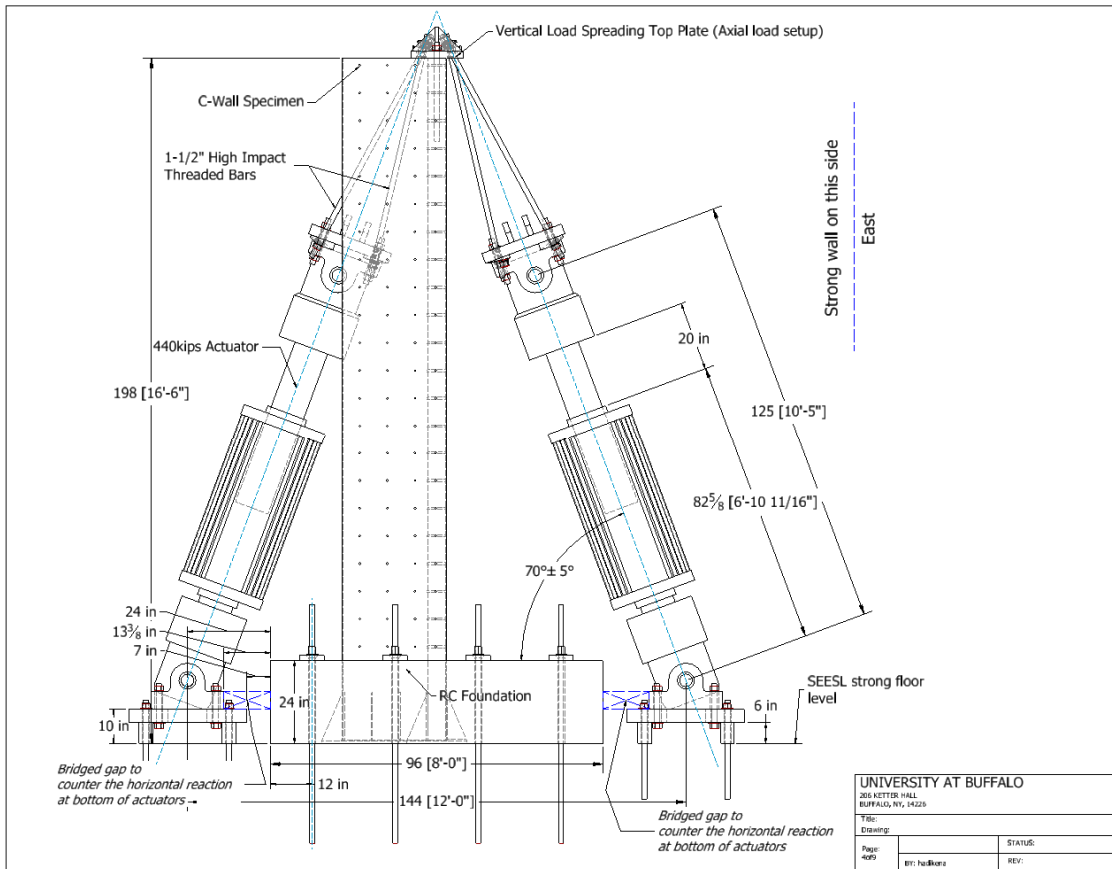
Elevation view of the vertical loading system (South elevation)
